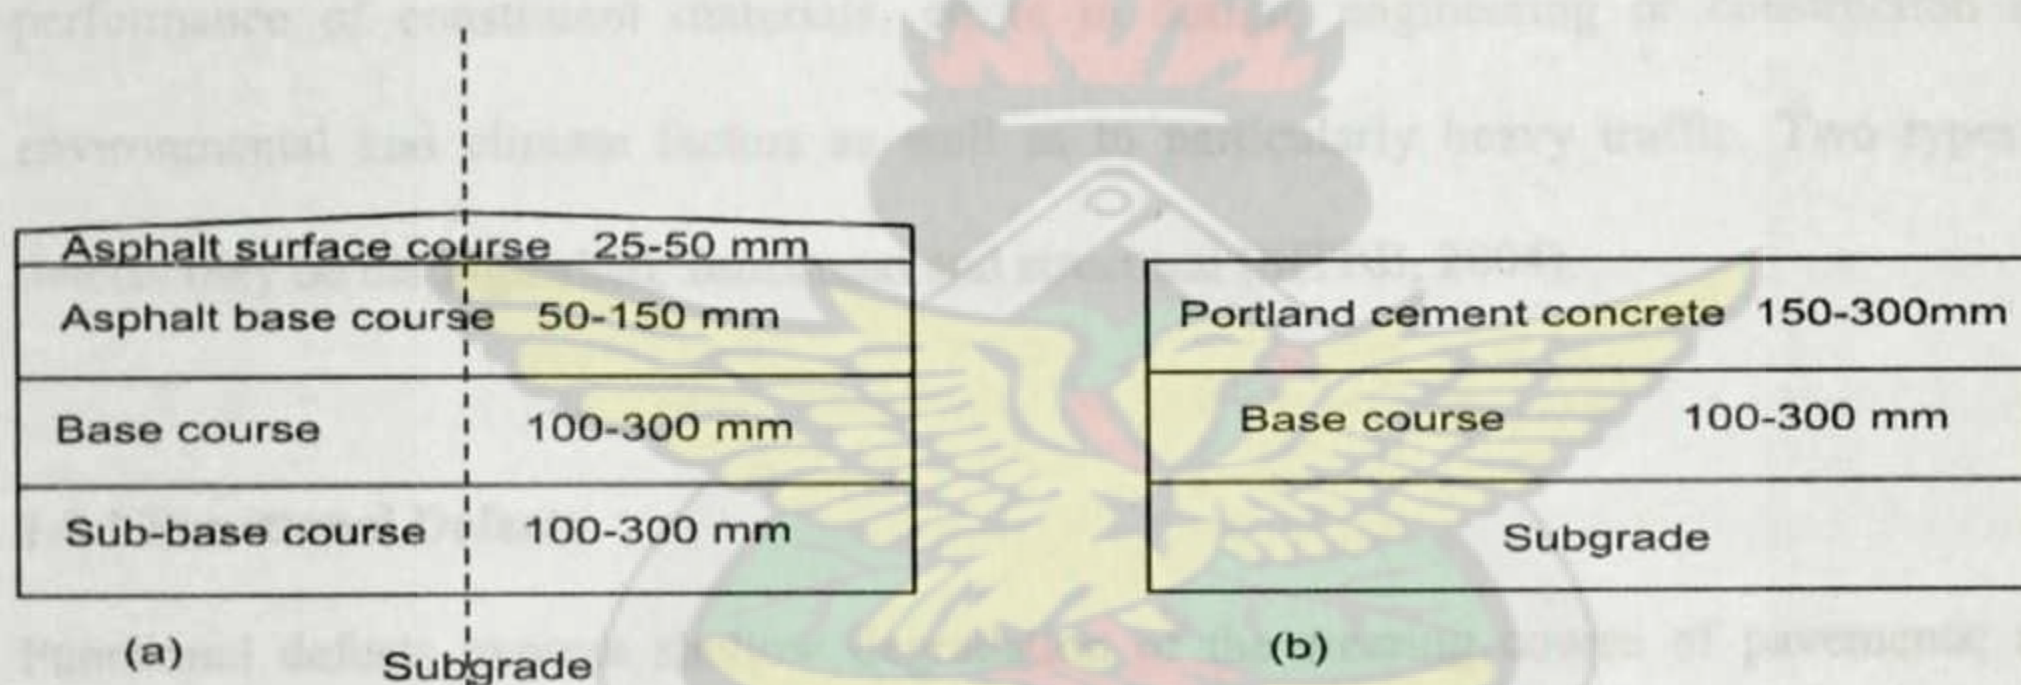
Typical Sections of (a) Flexible Pavement and (b) Rigid Pavement.
